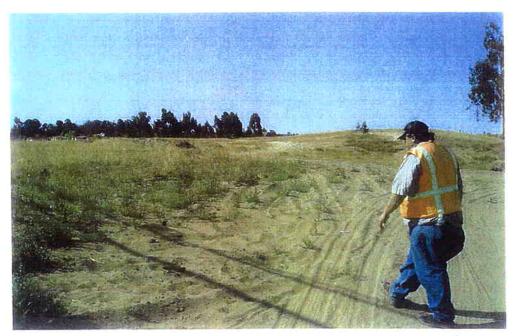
Graded Parcel West of South Frontage Road near Site SLO-808
